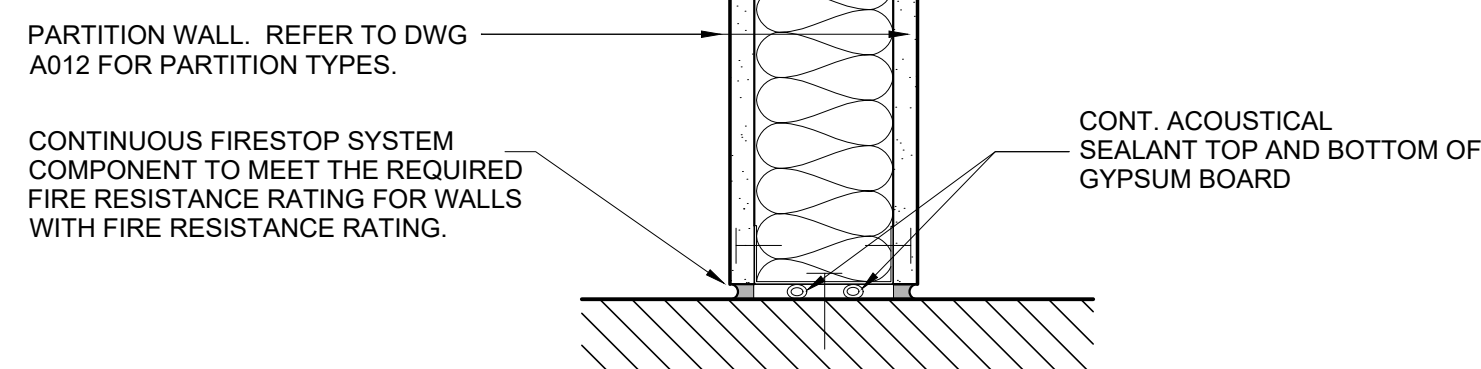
FIGURE B: GYPSUM BOARD PARTITION AT FLOOR
